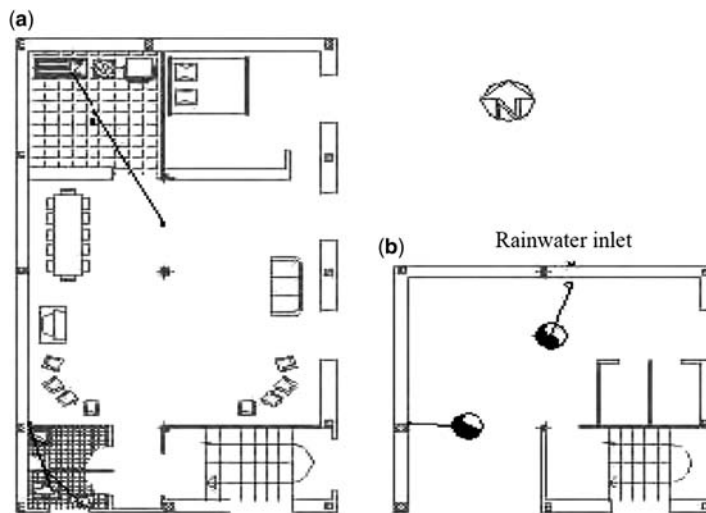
A plan for recent year's modern multi-storied building: (a) Ground floor sewer piping sitting plan and (b) Basement sewer and rainwater drain sitting plan (Scale: 1:100) (with permission of NWWEC).
